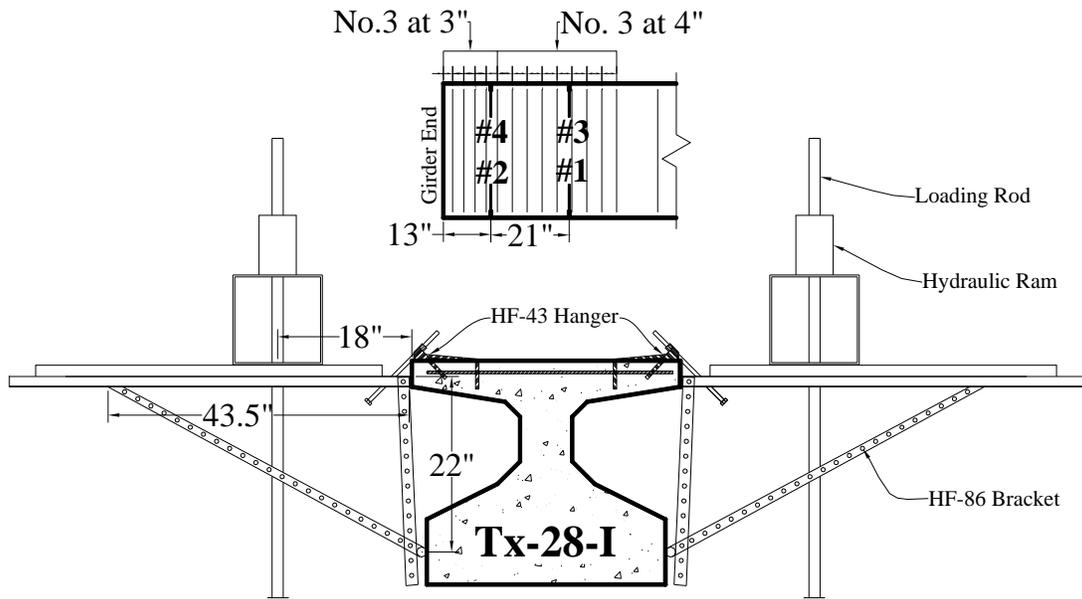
Reinforcement pattern and loading geometry for HF-43 on Tx-28-I
